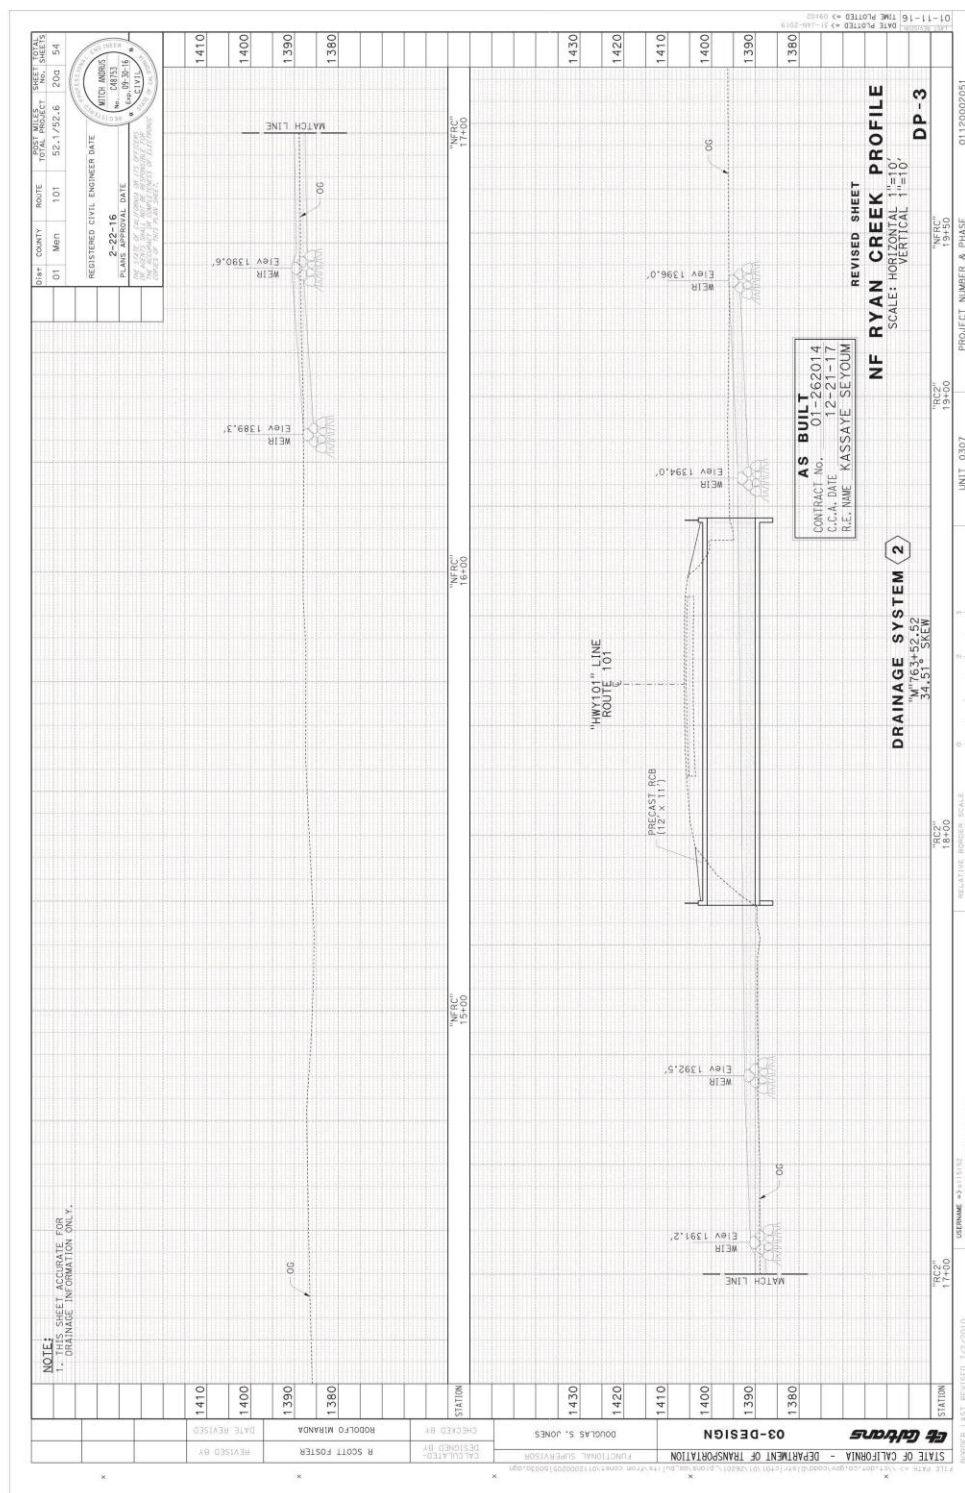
Caltrans design drawing of North Fork Ryan Creek profile. See the second page (DP-3) in Attachment 2 for full-size drawing.
